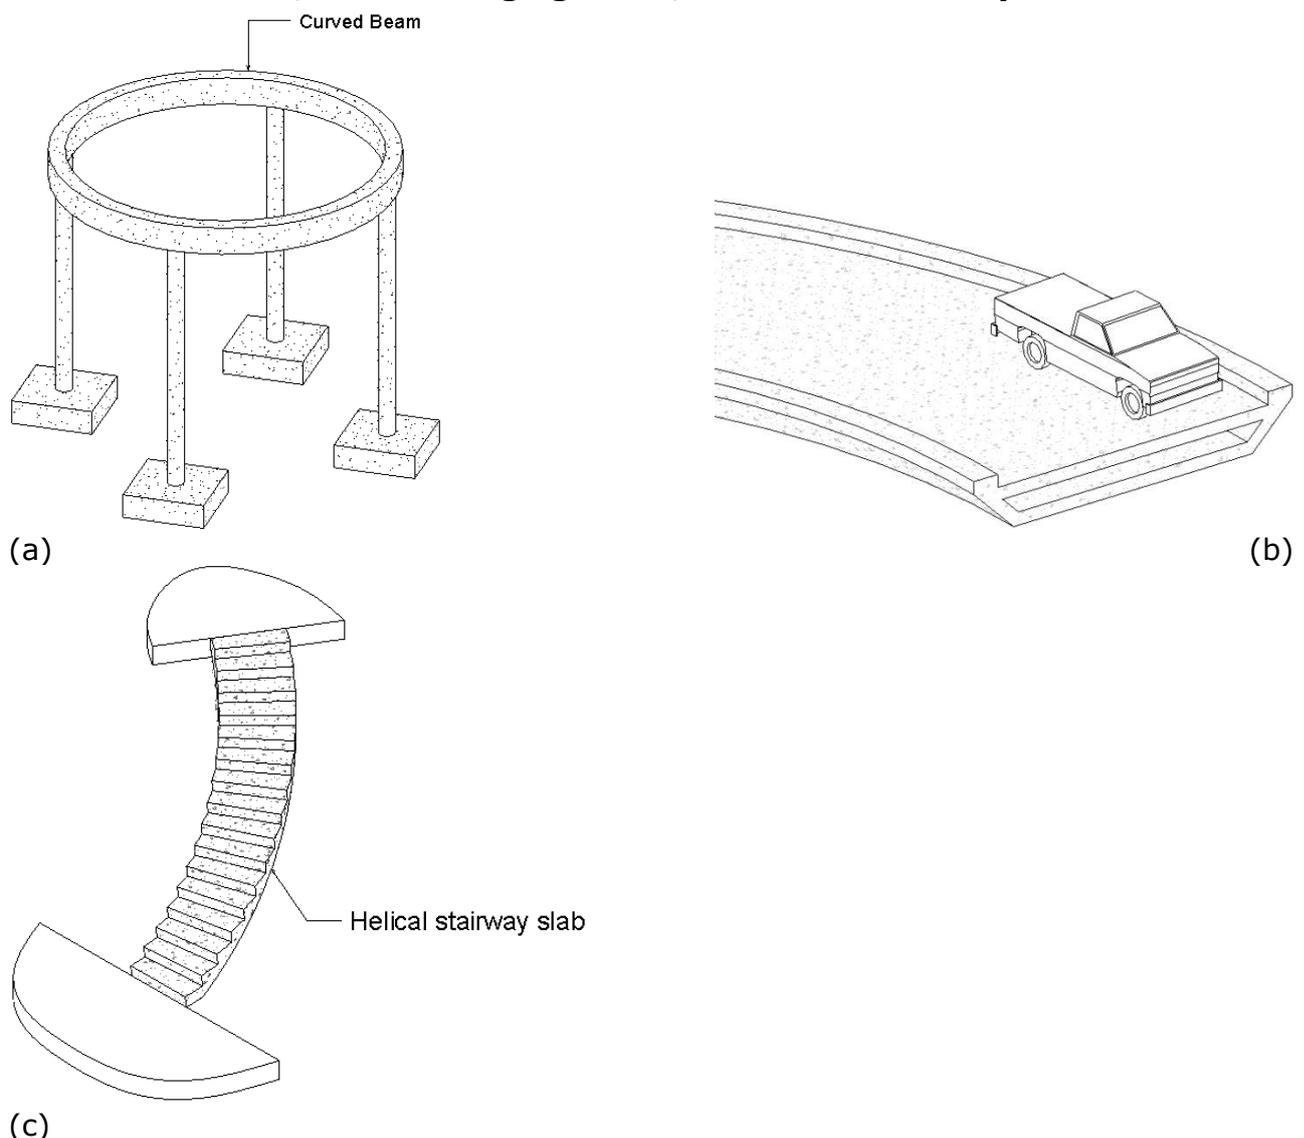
Members subjected to significant torsion: (a) curved beams; (b) bridge girders; (c) helical stairway slabs.
